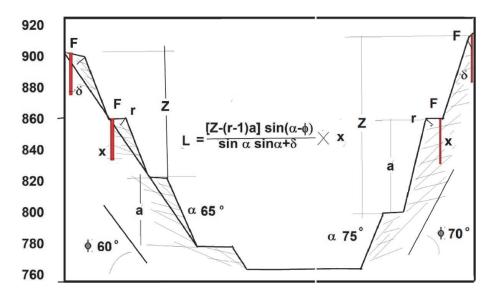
North and south steep slope faces of Avgamasya No. 1 pit of Şırnak asphaltite coal mine site and survey area with anchorage pile pattern.
